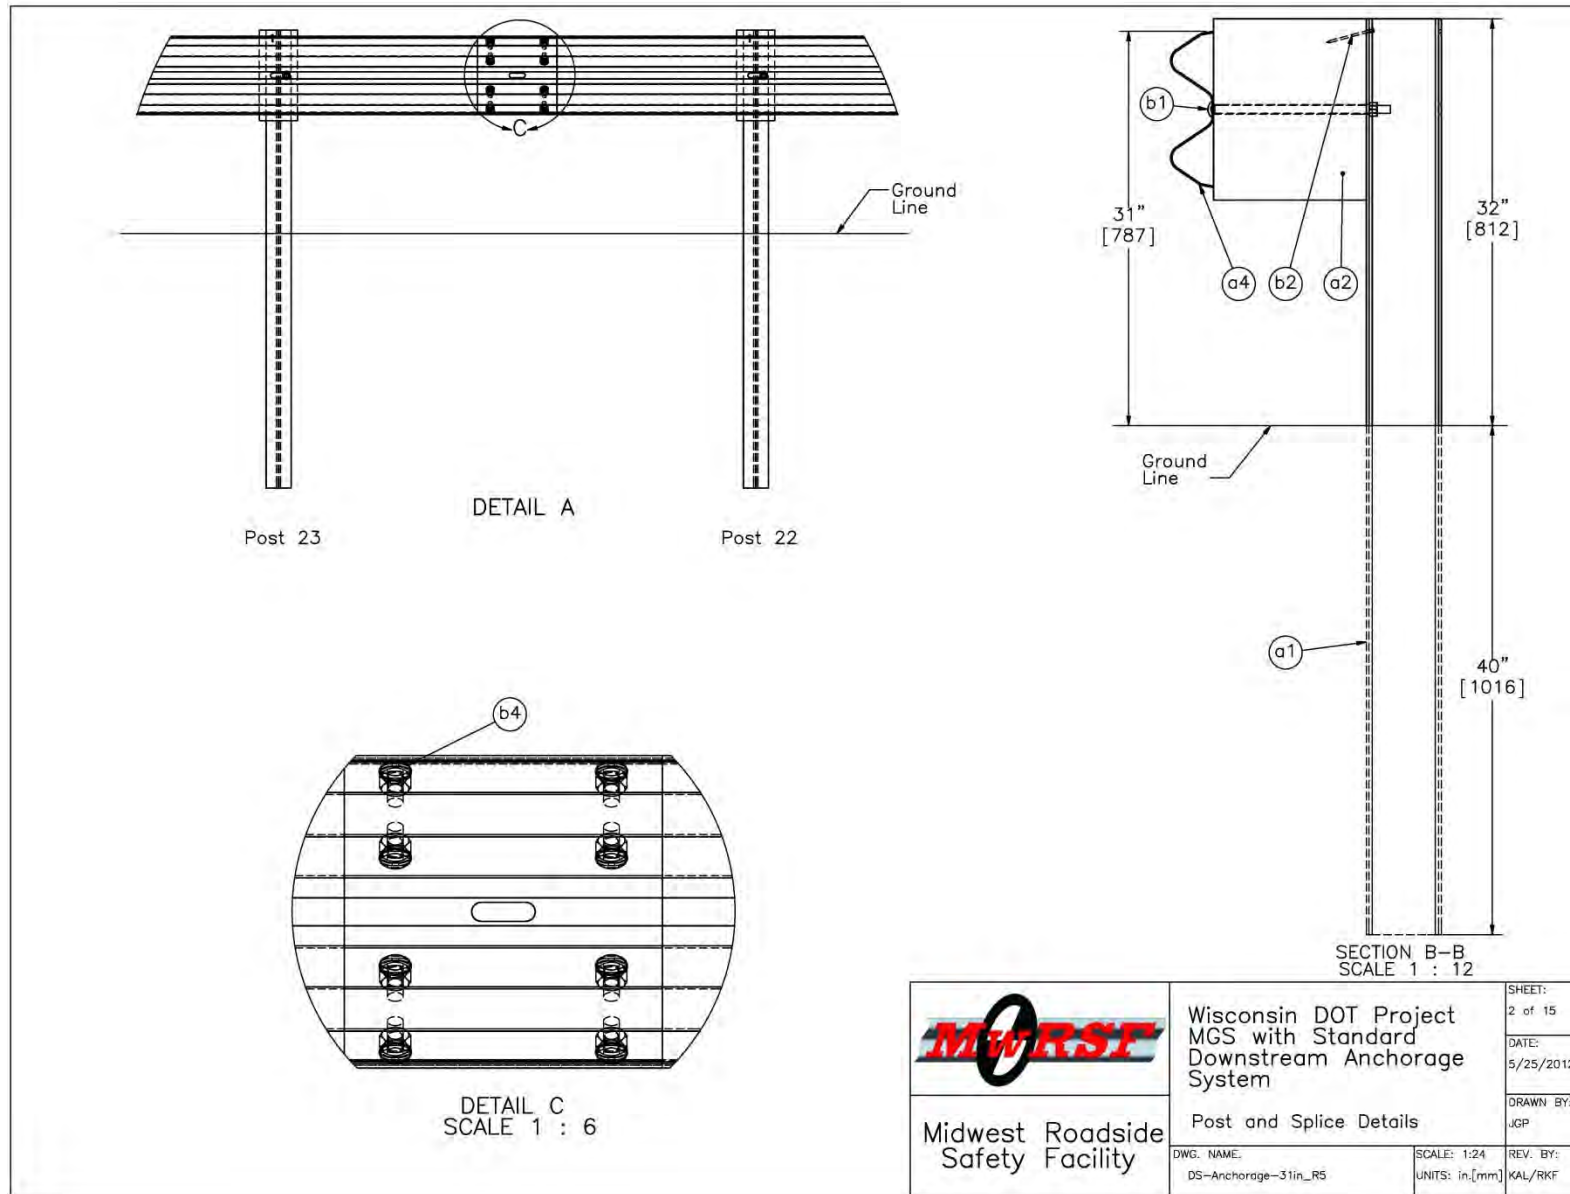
31-in. (787-mm) Tall Blocked MGS Details, Test No. WIDA-1
